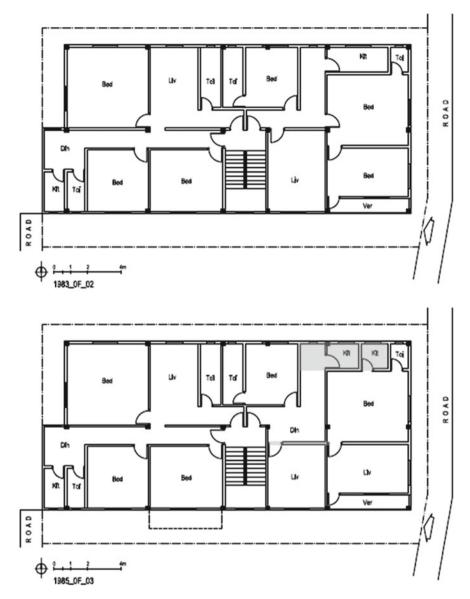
Construction hazard tends to be limited to minimum. Here dividing an existing kitchen into one toilet and one kitchen, and shifting one wall to make a dining space is all that was needed to subdivide the existing unit into two (*shaded*). *Source* Author
